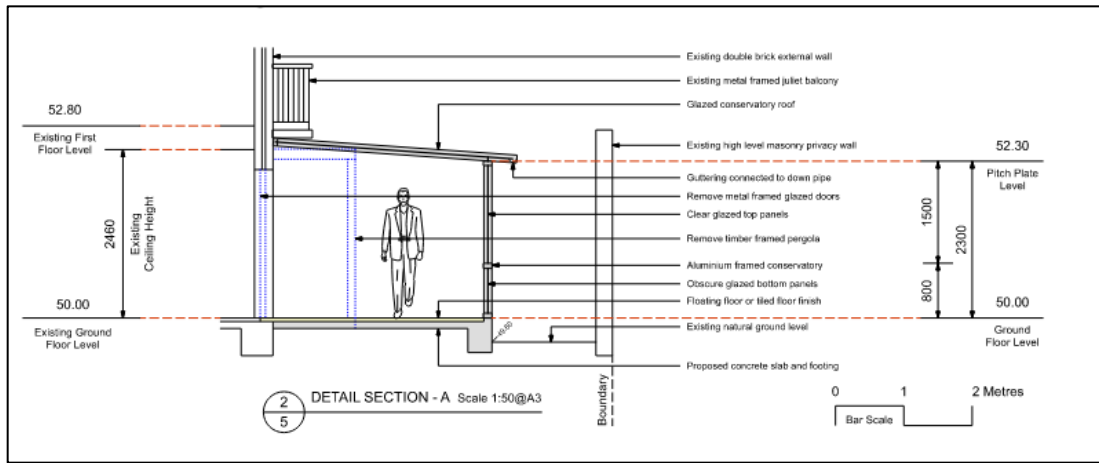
Proposed Section Plan (Source: Red Rock Design).
